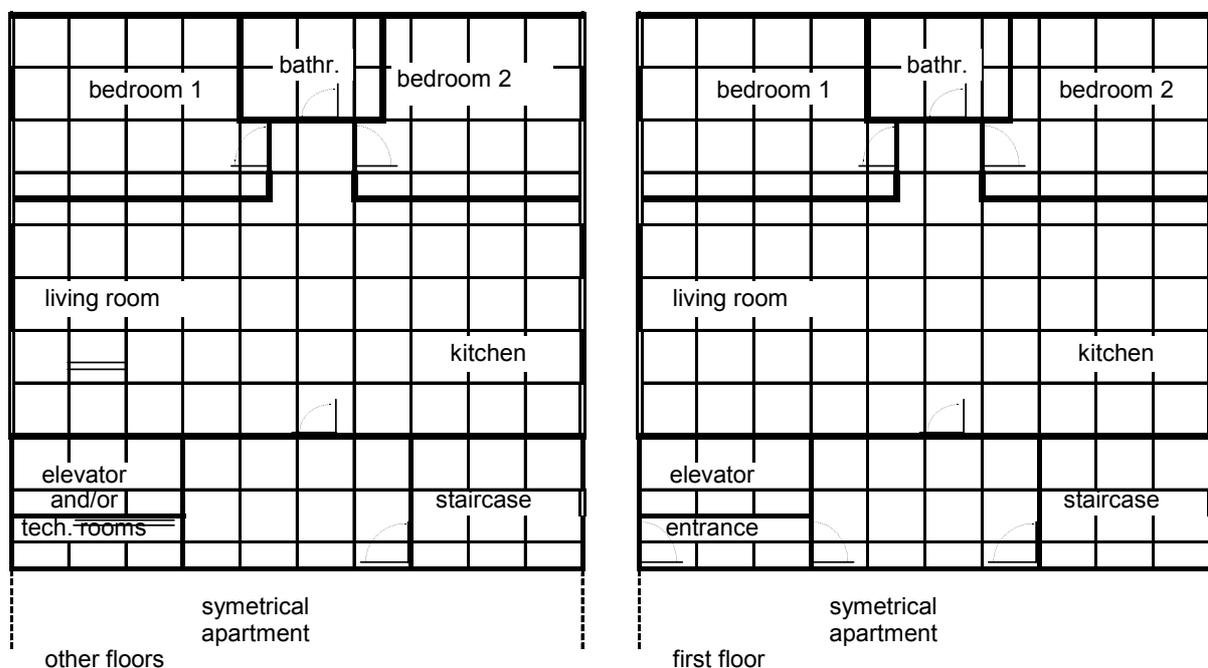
Three room apartment D3c (ground floor and top floor)
